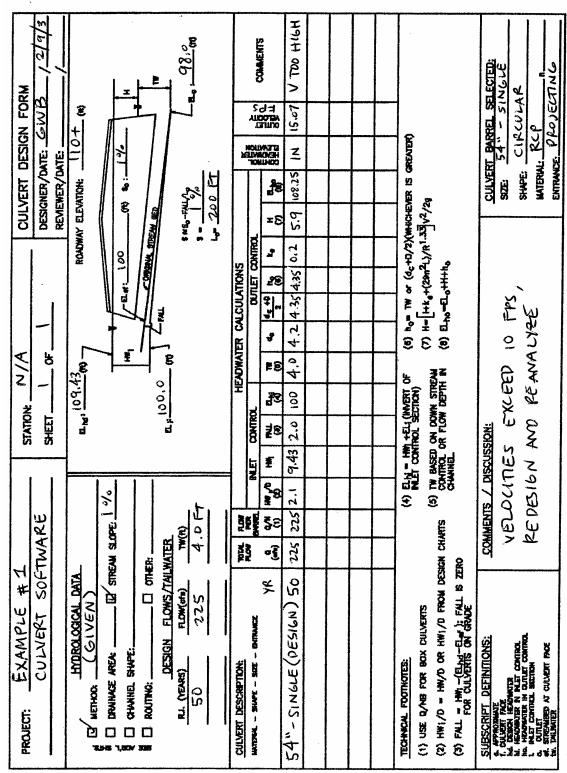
Culvert Design Worksheet for Example #1 (Federal Highway Administration, HDS, No.5)
